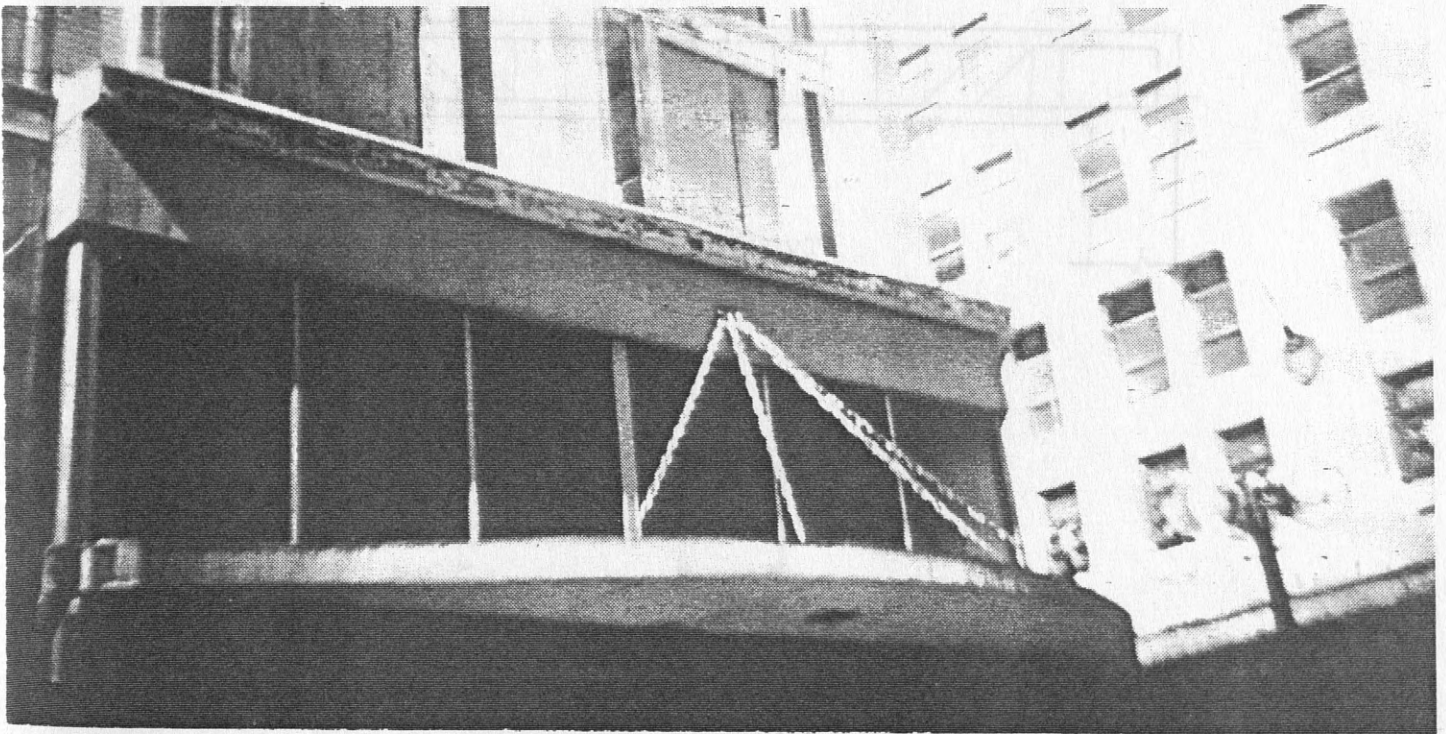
Front Wall Ornamentations at Mid-America Mall
